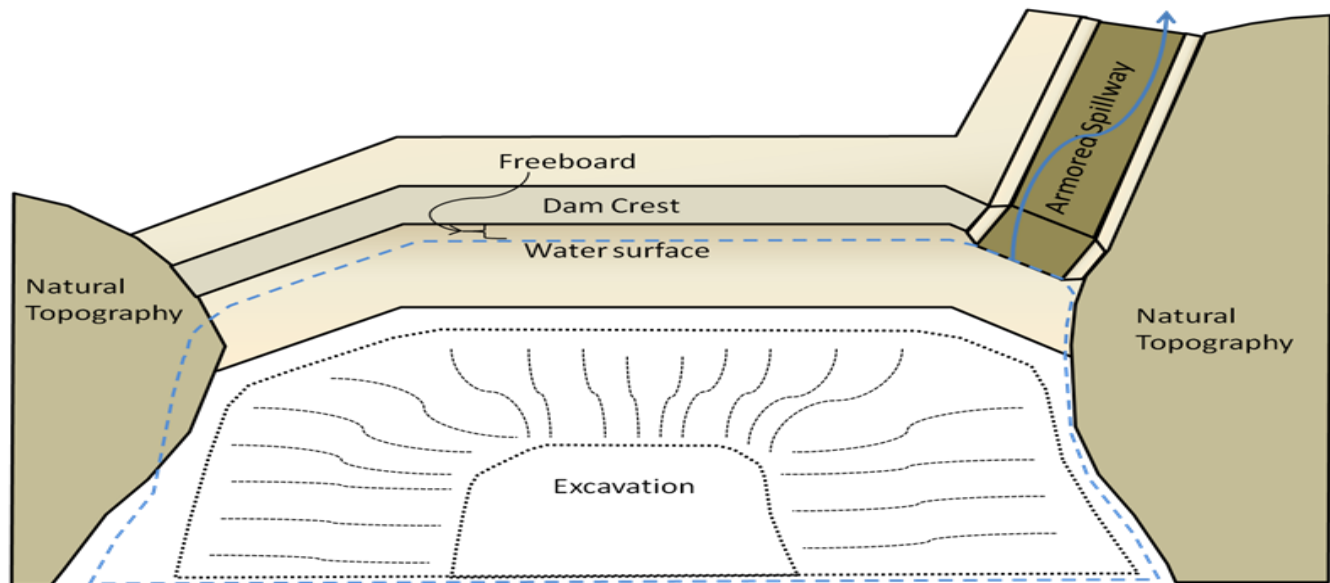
Example plan view of dam and pond excavation showing the spillway directing water away from the dam.
